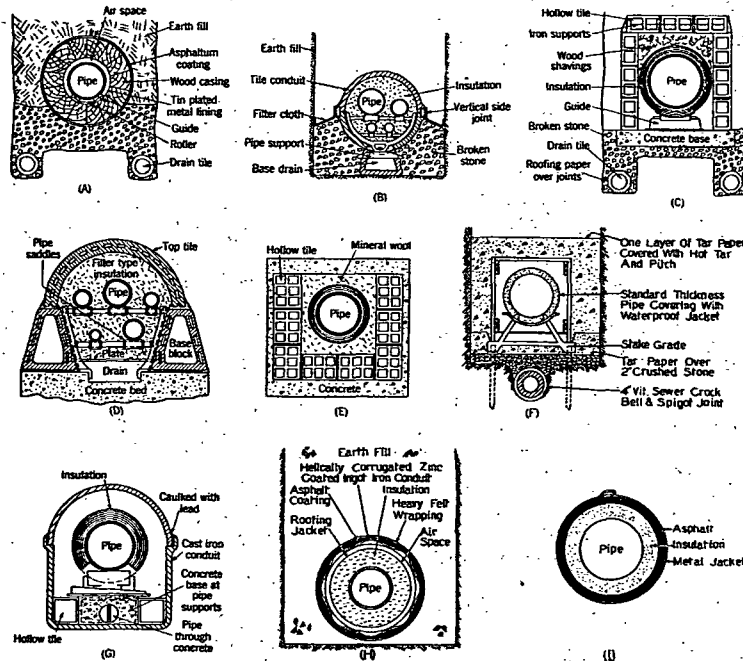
CONSTRUCTION DETAILS OF CONDUITS COMMONLY USED
